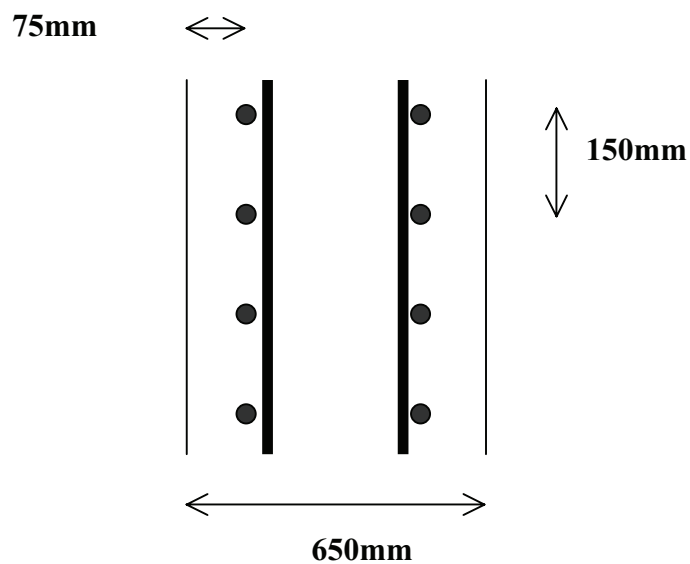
Sectional elevation view – horizontal Reinforcement
